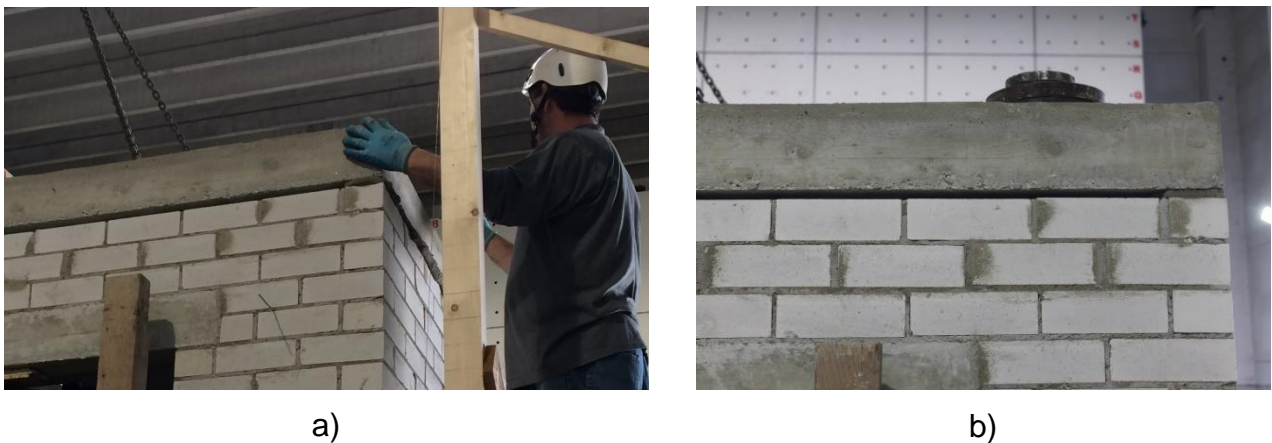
Reinforced concrete slab positioning: a) North-East corner; b) unsupported East side.
